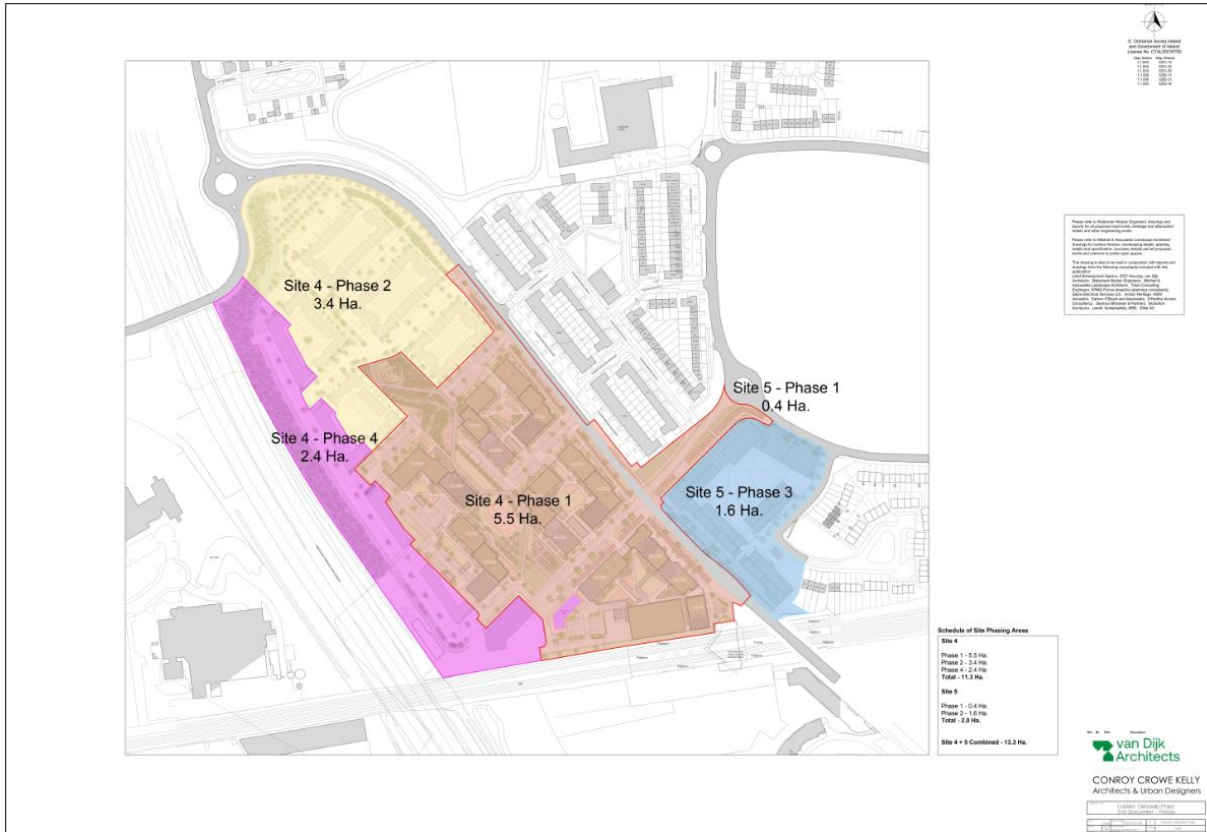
Phasing Plan for the delivery of the Proposed Development on Key Sites 4 and 5 under the Park West Cherry Orchard Local Area Plan 2019 (Source: Van Dijk Architects and Conroy Crowe Kelly Architects).
